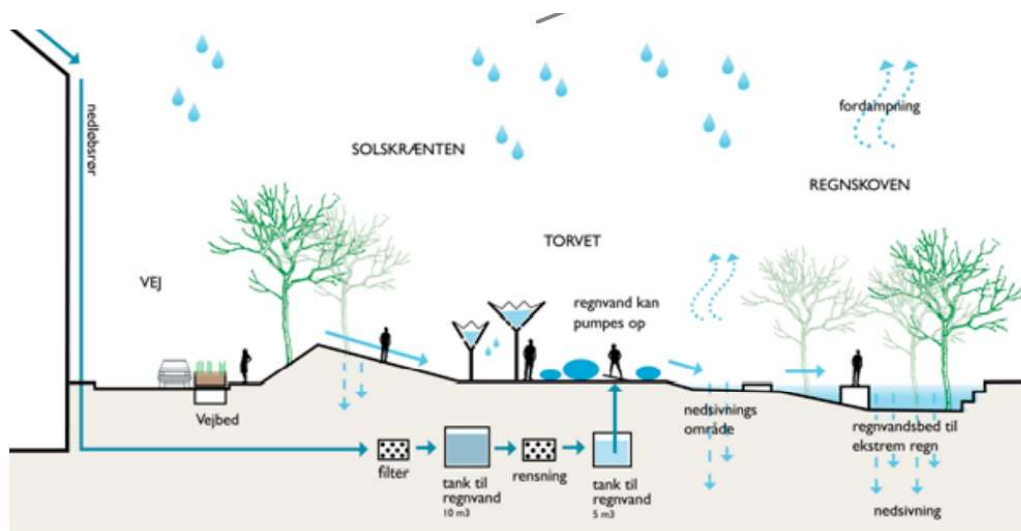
Rainwater harvesting from surrounding roofs are used for water play in Tåsinge Plads
